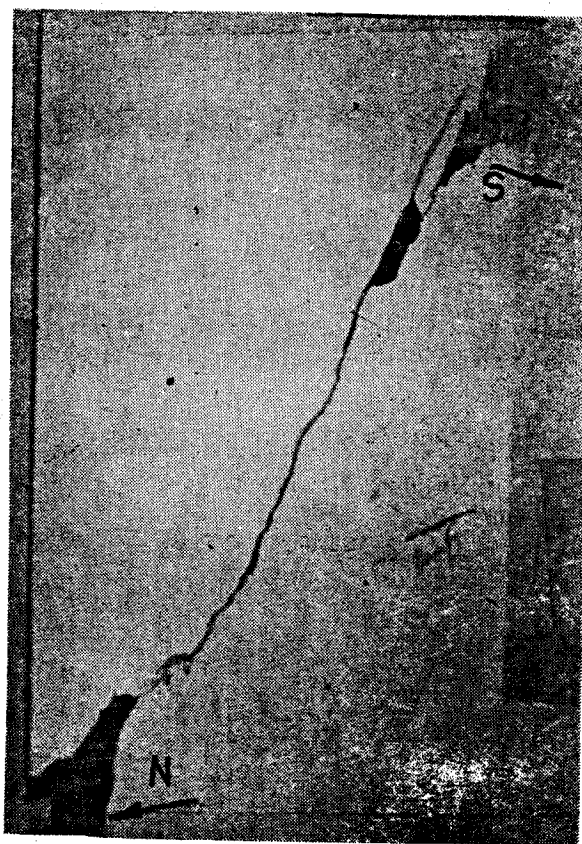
Diagonal Cracks bearing wall at Broach
